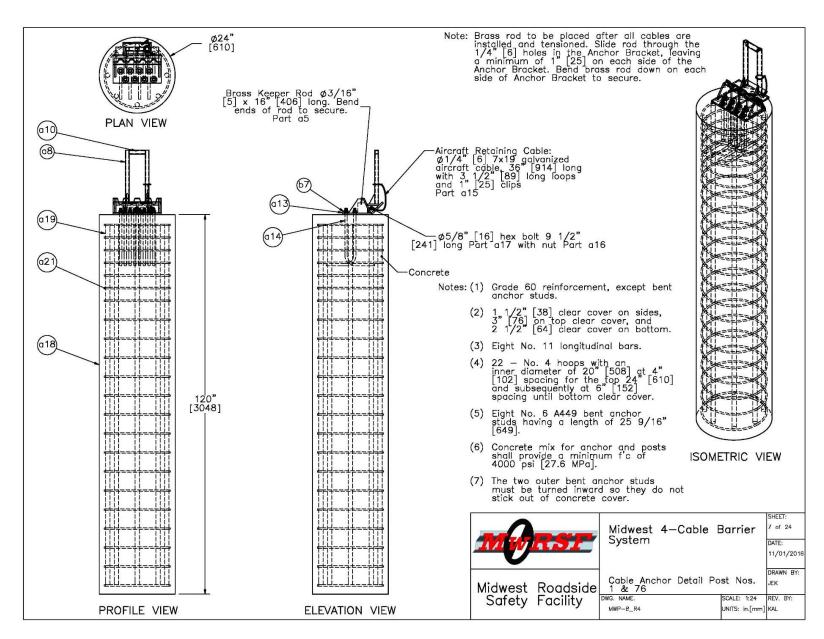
Cable Anchor Detail, Post Nos. 1 and 76, Test No. MWP-8
